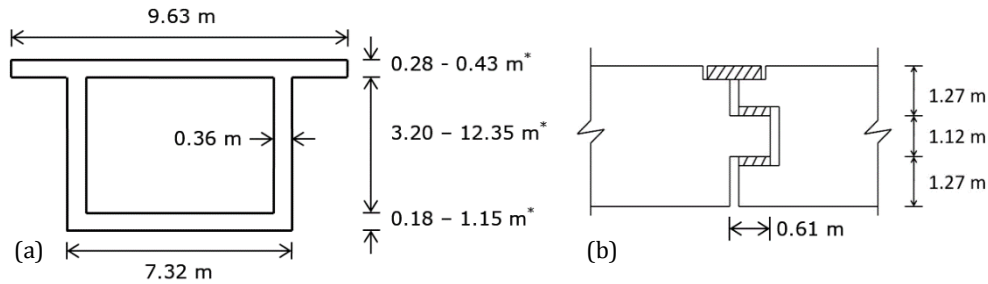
a) Cross section of box girder at main pier, and b) hinge at the center of mid span.
